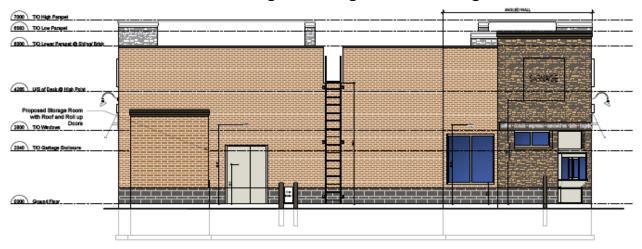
#### Exhibit B – Site Plan Set of Drawings, Building Elevations, Page 5 of 6
